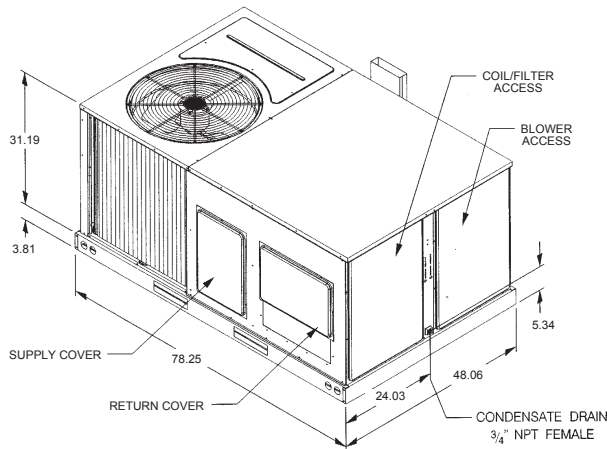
Cabinet Dimensions and Access Locations – Gas Heat Units
